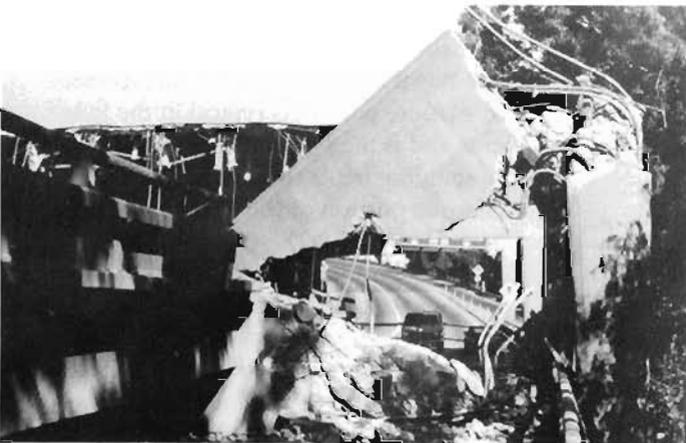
Shear failure in upper girder of Bent 112 (east side).
